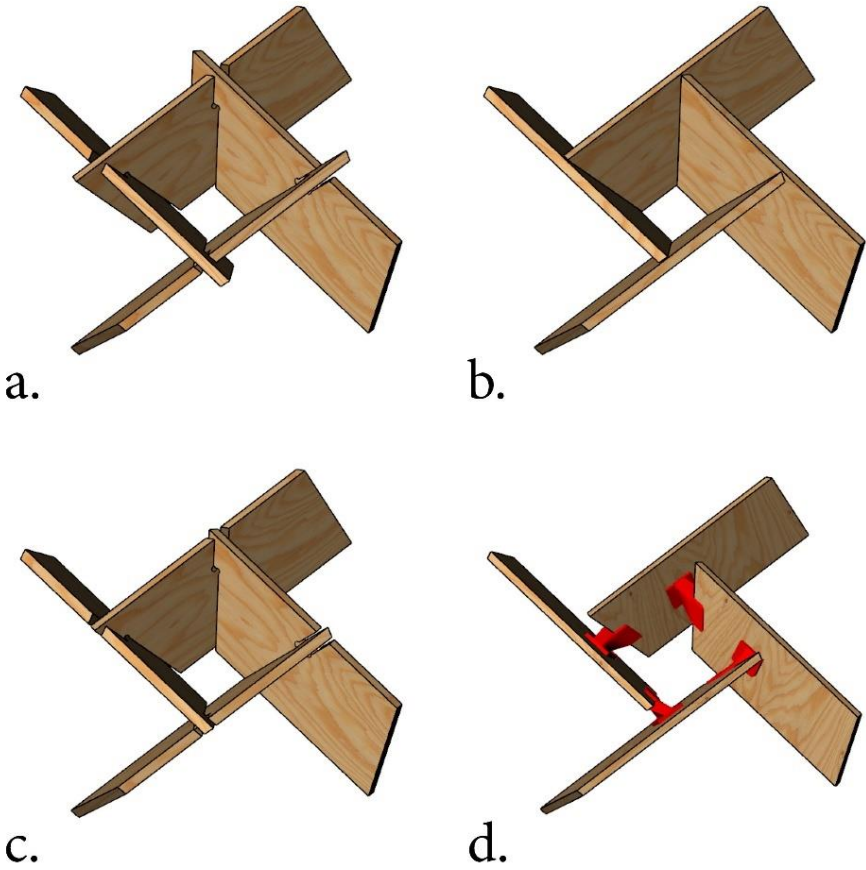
A. Conventional reciprocal connection adapted for rotated reciprocal members, b. T-joint member connection, c. modified conventional connection, d. 3-D printed connection.
